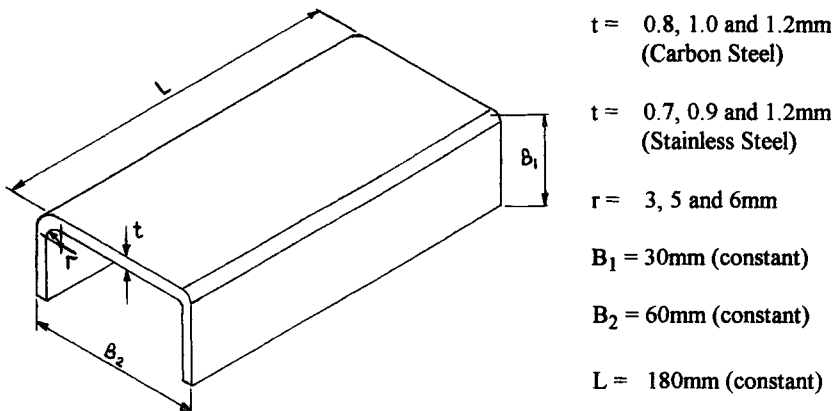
Cold Formed Plain Channel Section Nominal Dimensions.
